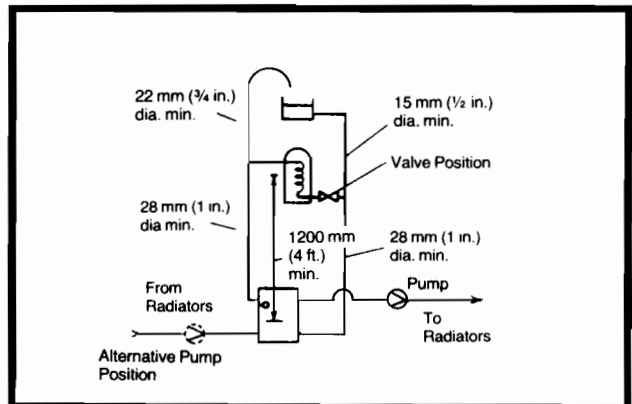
FULLY PUMPED WITH TWO POSITION DIVERTER VALVE
